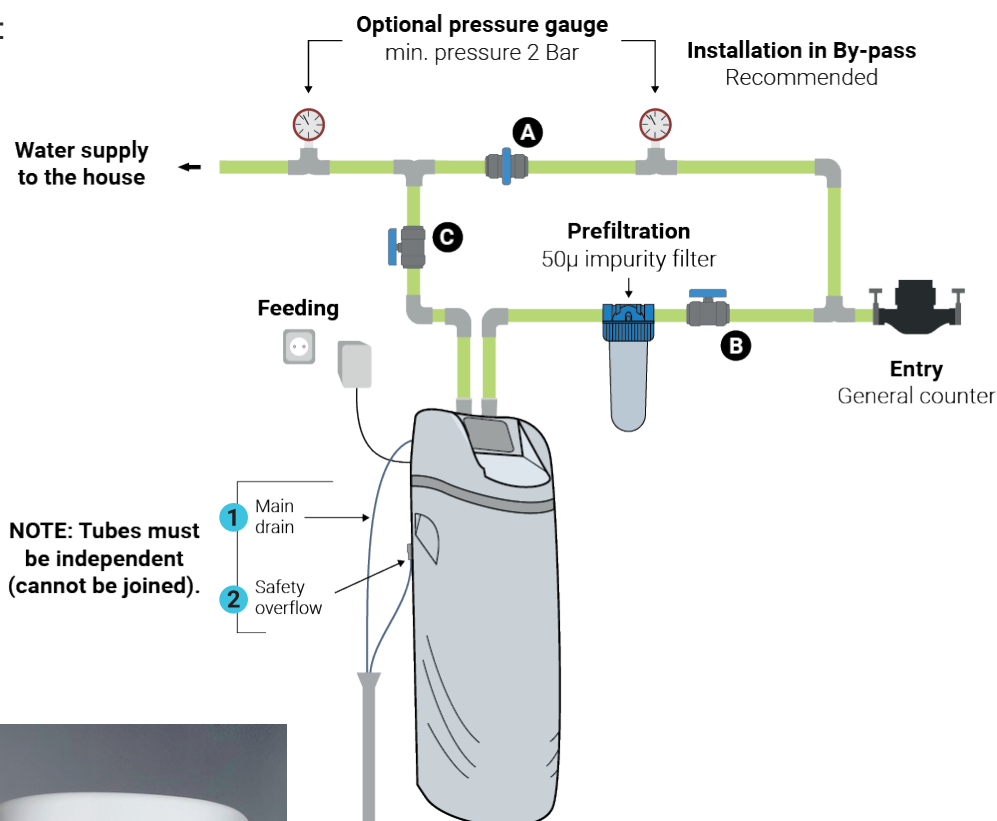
Illustration: Install 3 ball valves to connect the control valve and the inlet and outlet pipes. Valve A is connected between the inlet and outlet. Valve B is connected to the inlet of the control valve. The C valve is connected to the outlet of the control valve. When the resin tank needs to be repaired, you will need to open valve A and close valves B and C. When using the equipment, you must close valve A and open valves B and C.
